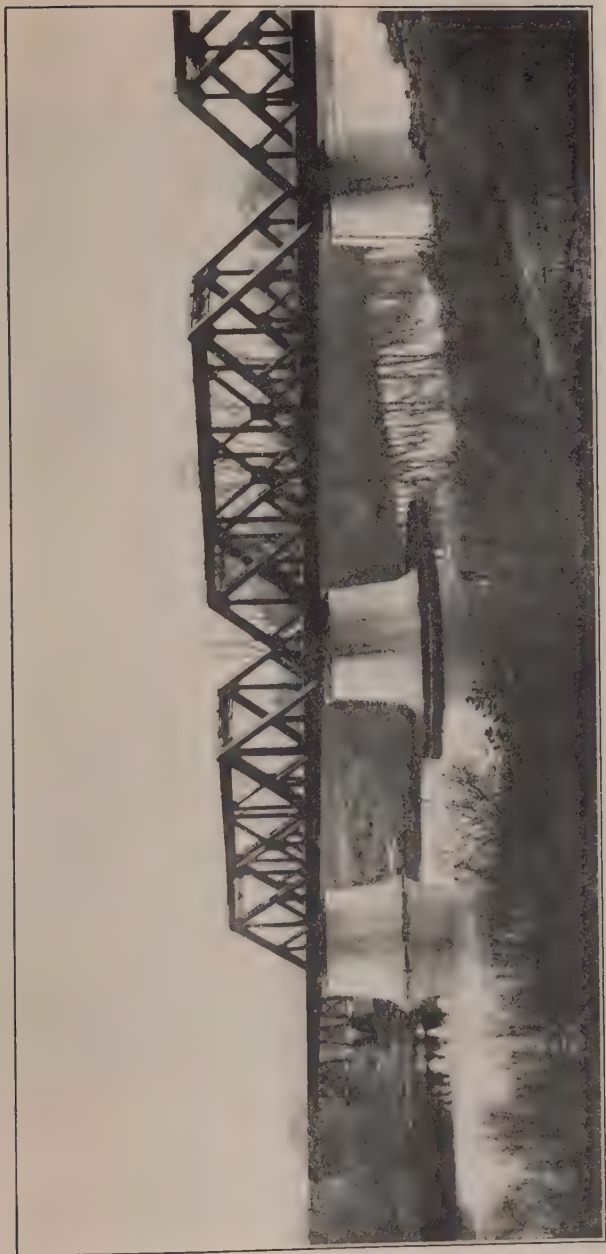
Ft. Span Riveted Trusses. Typical of 1915 Construction.
